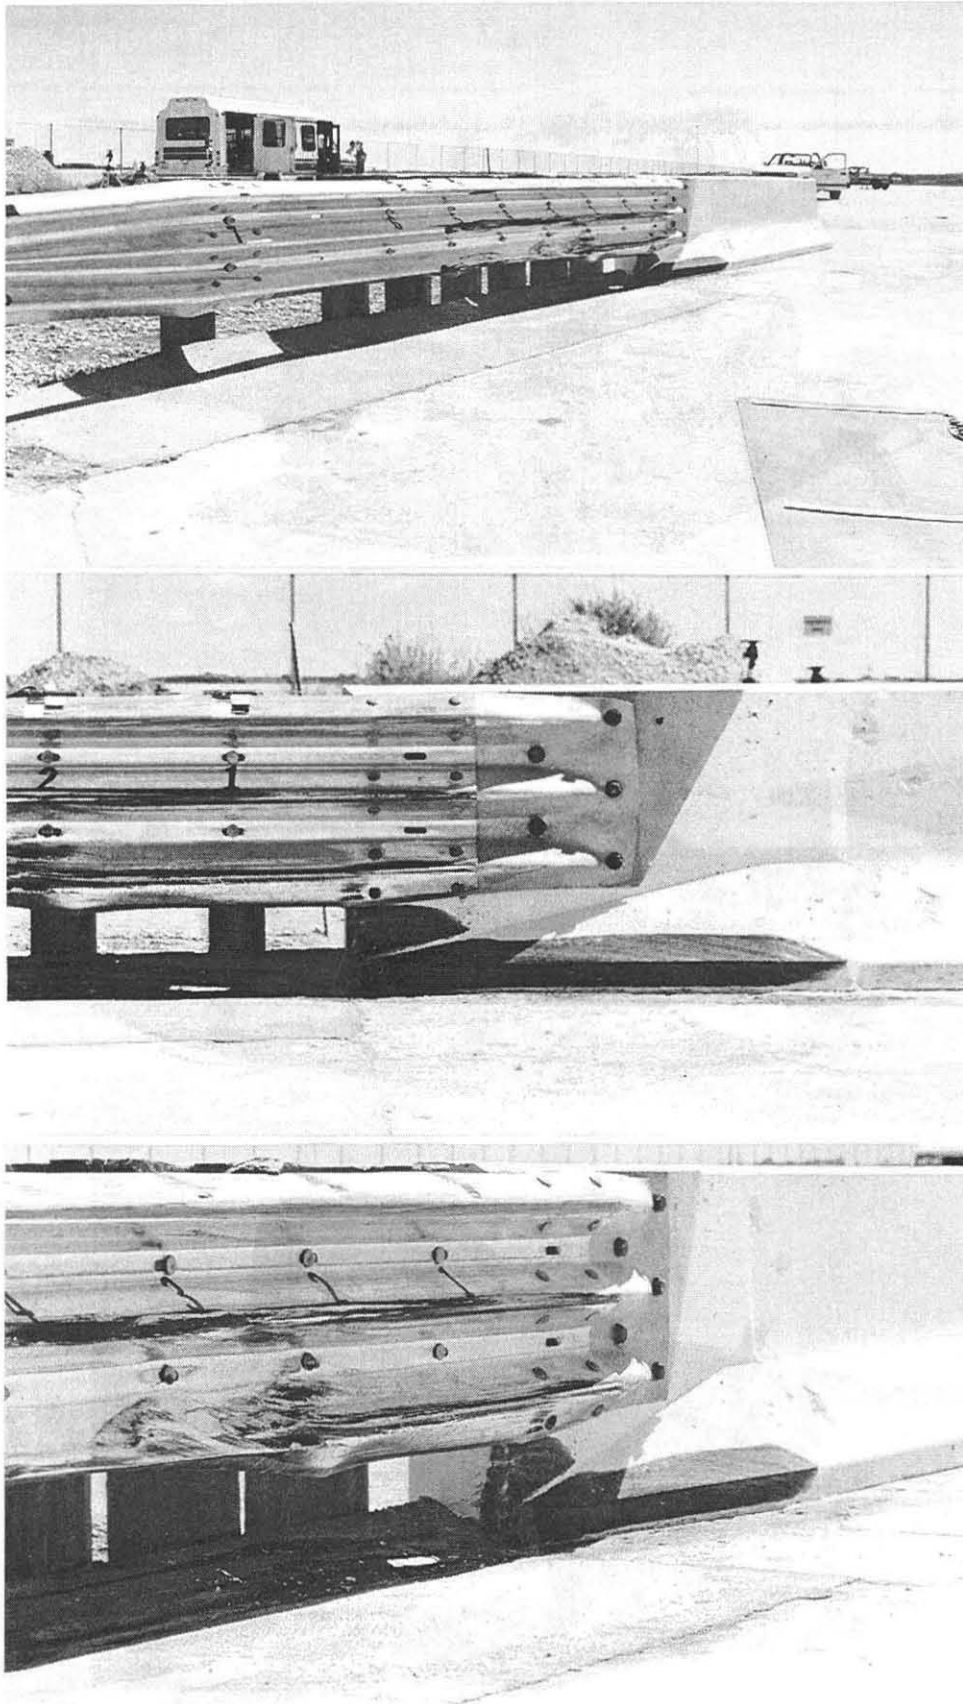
Barrier Damage, Test ITNJ-4 (Design No. 4)
